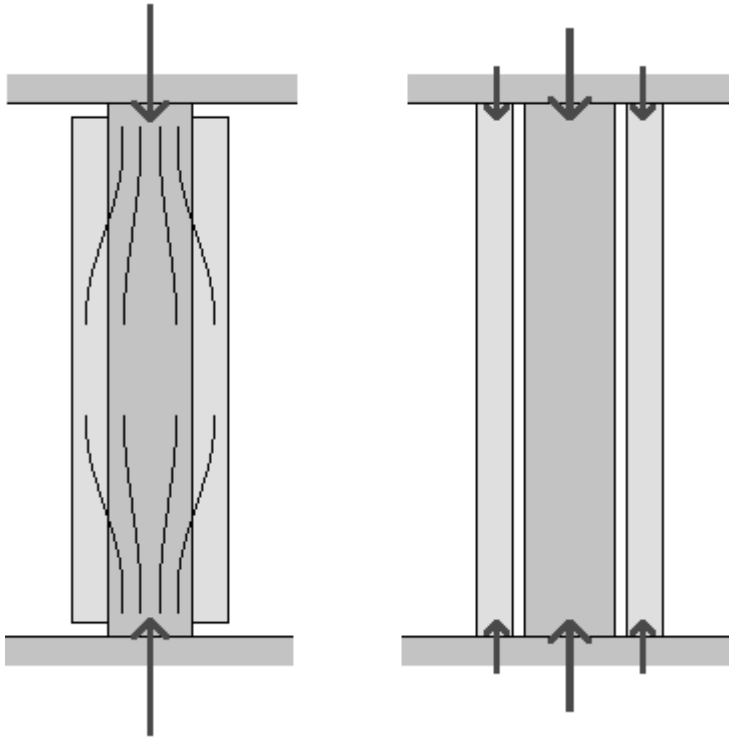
Strengthening of columns with steel profiles that a) are loaded through the original column and b) are loaded directly from above.
